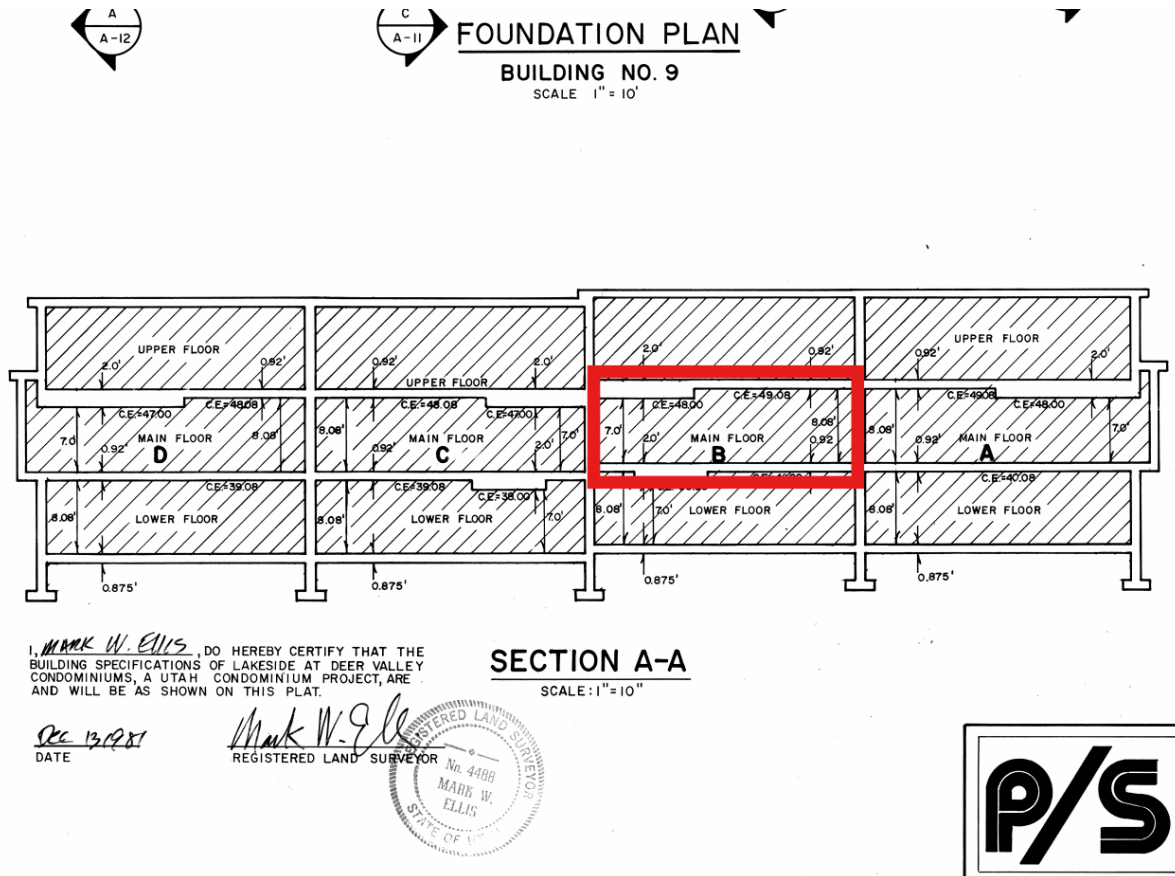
Existing Plat with Proposed Addition Redlined by Staff
